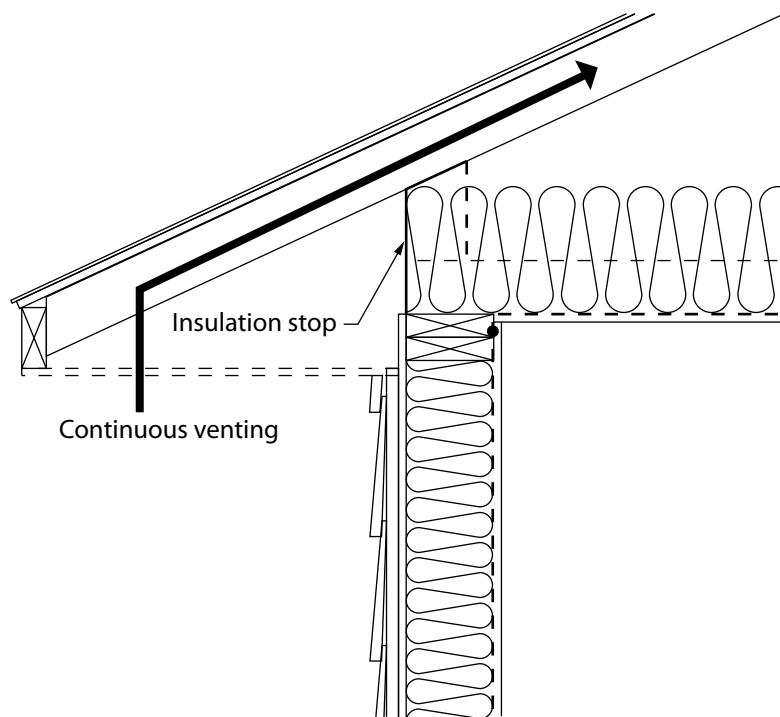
Vented soffit, raised heeled trusses and insulation stops for continuous ventilation at the bottom of the roof space
